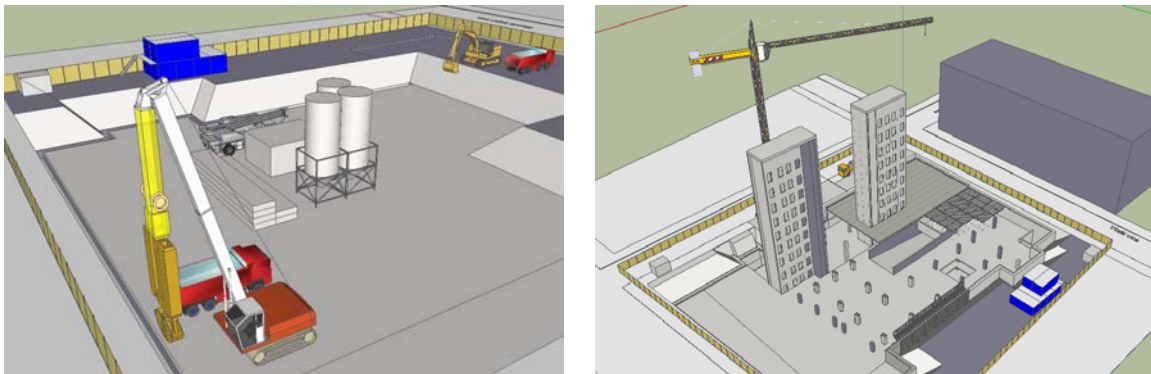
Site-layout details from diploma work by Beatrix Strauss
